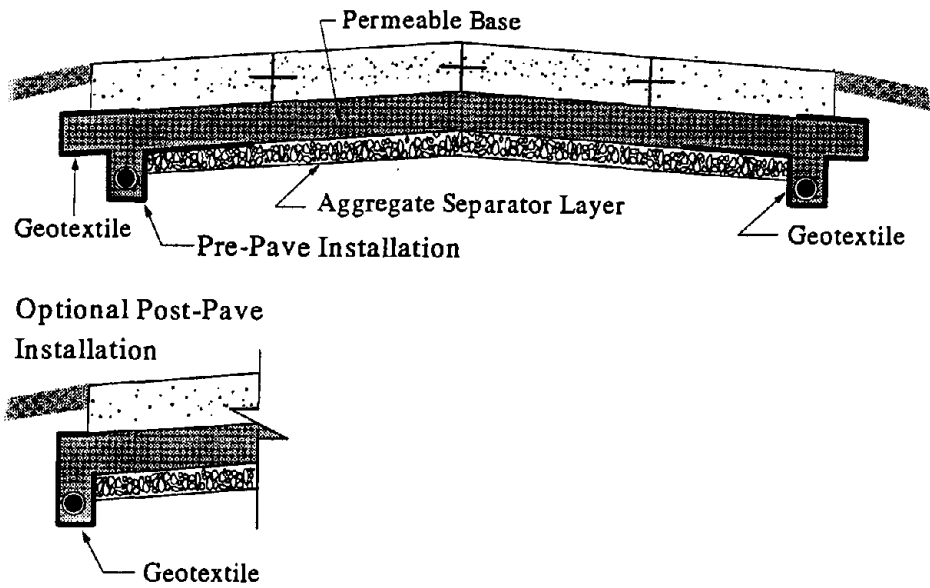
Typical cross section of subsurface drainage systems for crowned section and tied concrete shoulders.<sup>(51)</sup>
